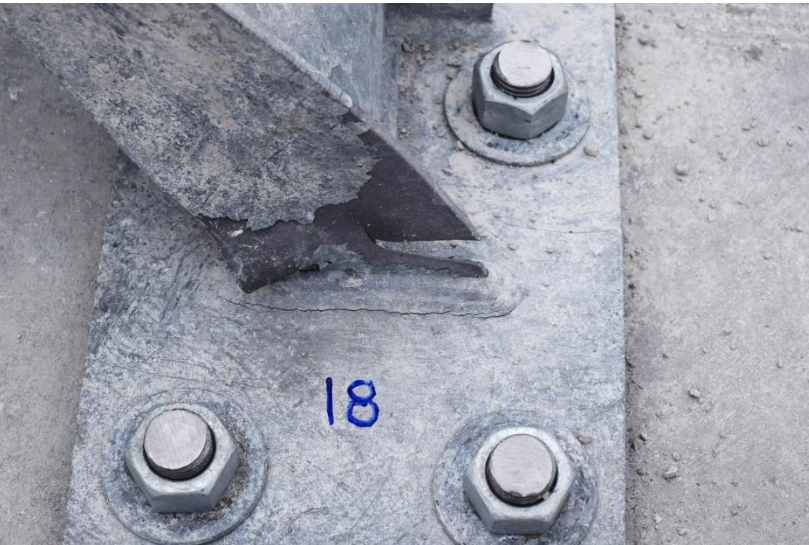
Damage to Post and Base Plate Nos. 18 and 19, Test No. CMGS-1
